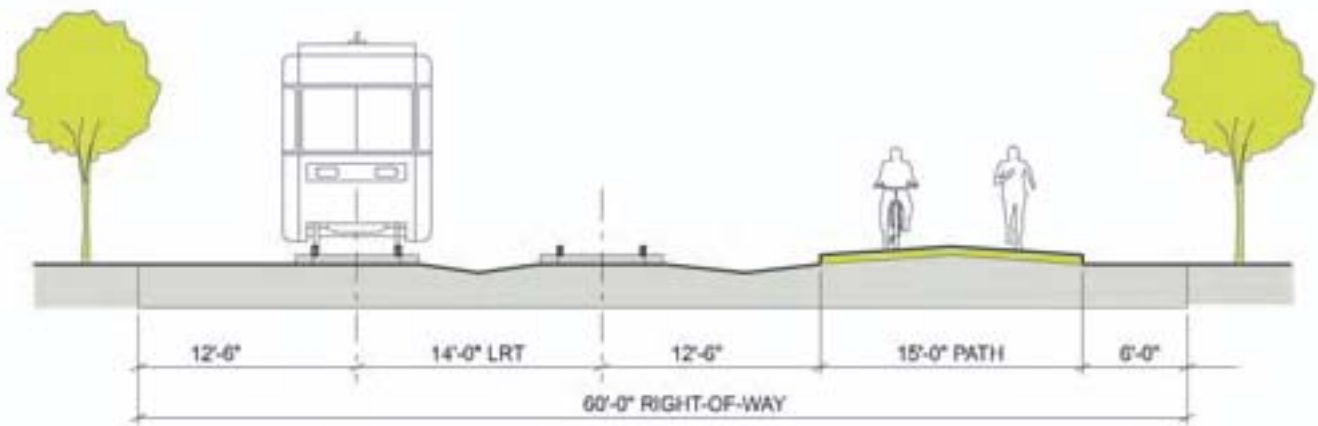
Typical Beltline cross section for simple trail and drainage swales
